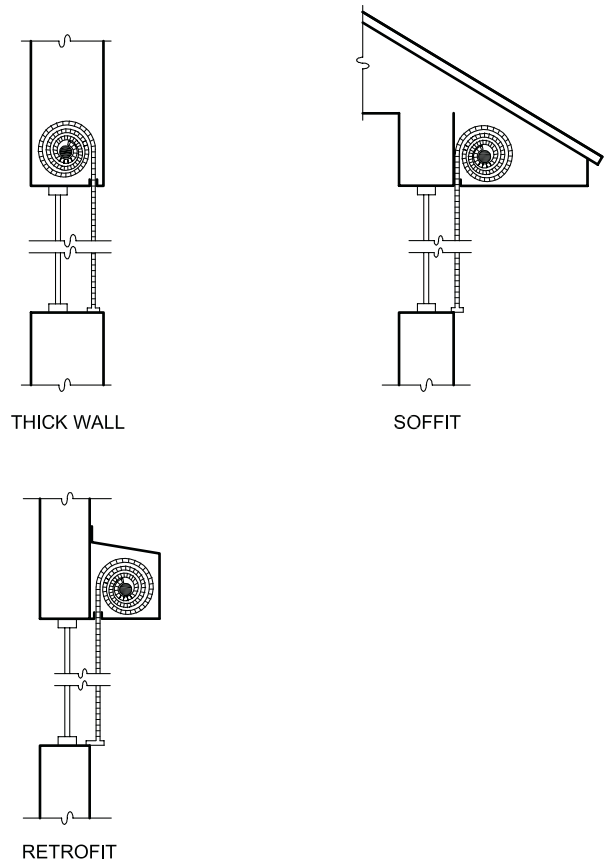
Although it is best to integrate exterior roller shades into the design of a new building, they can be added to existing buildings.
